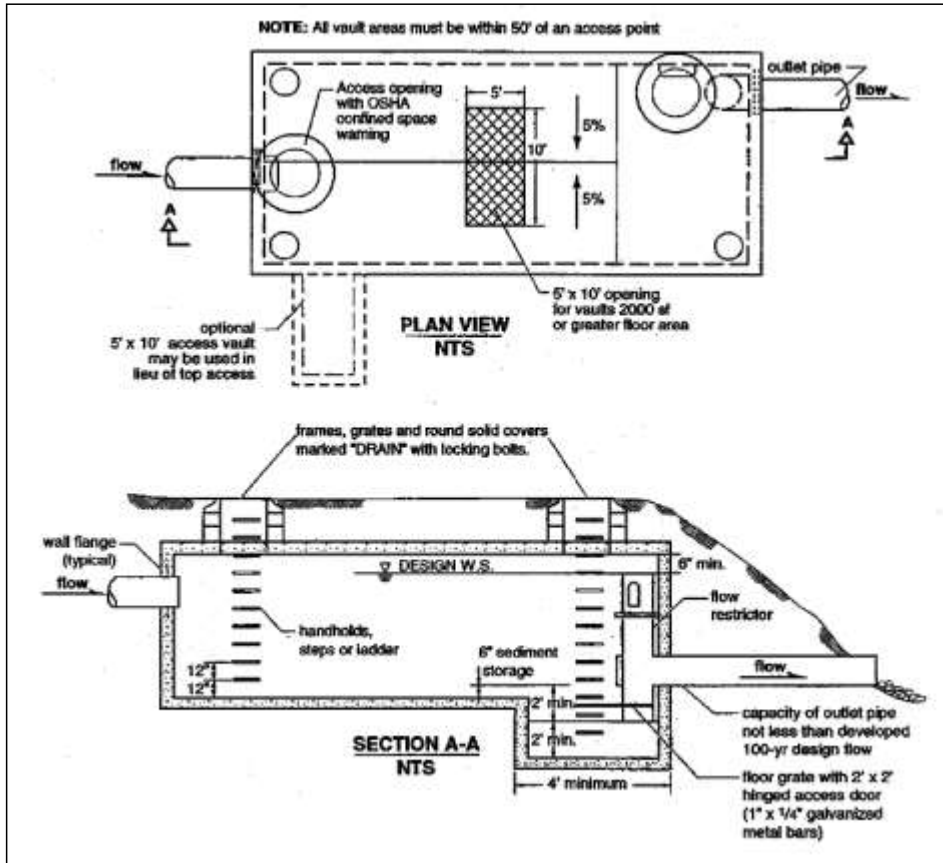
Schematic of Typical Underground Detention Vault
